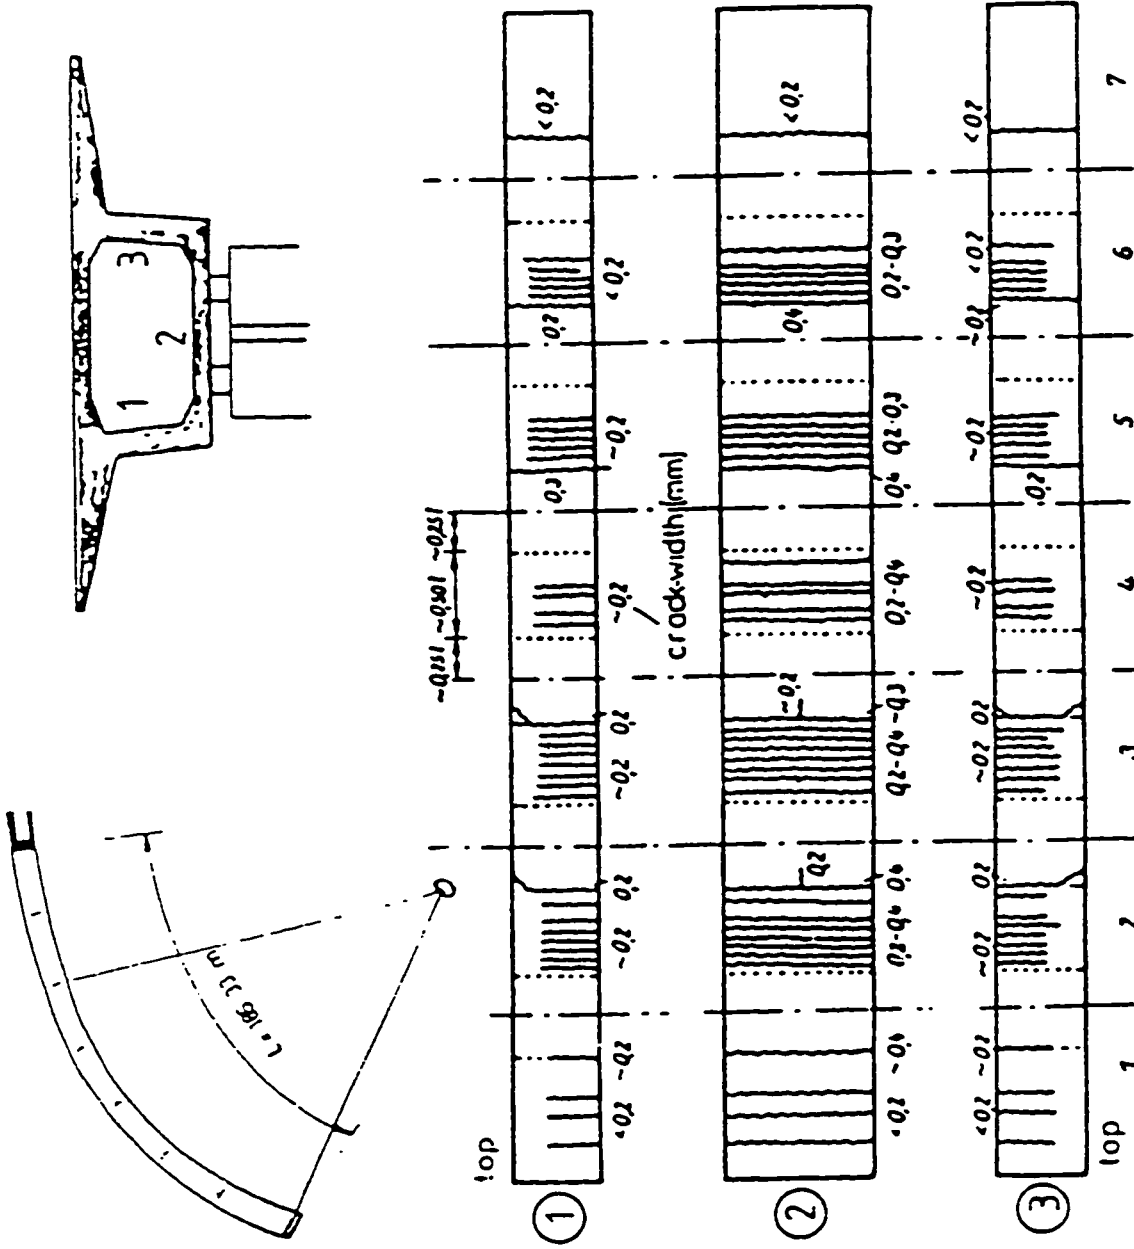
Cracks reported in a multispan box girder bridge by Zichner (1981)
